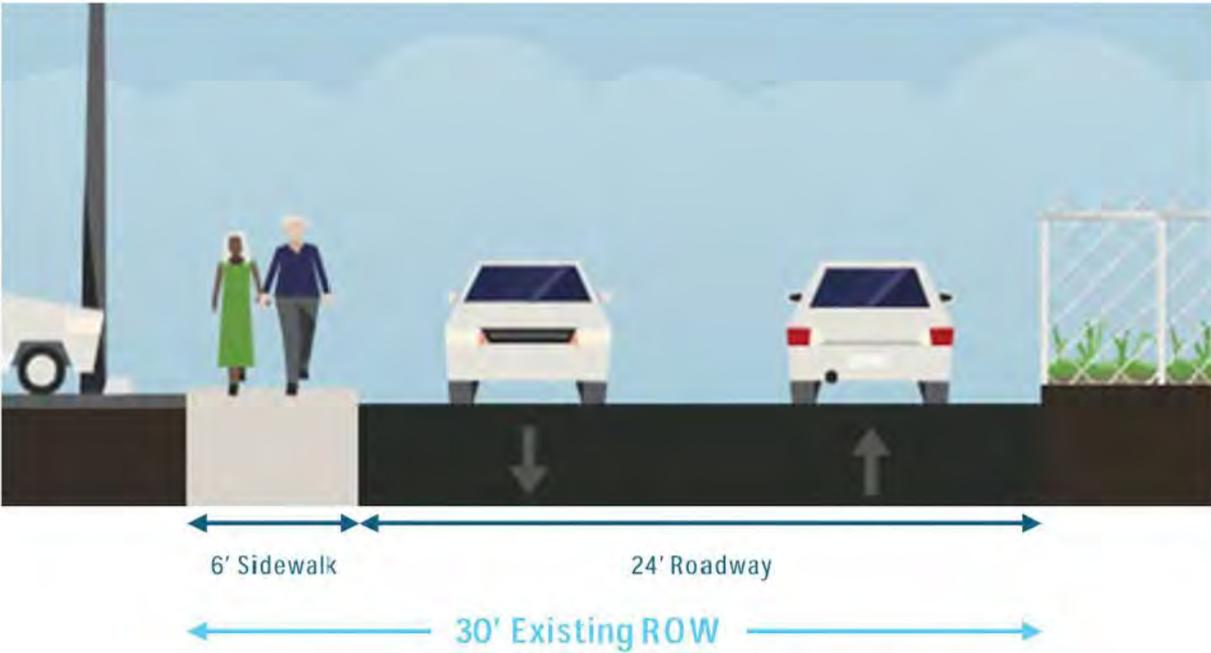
Existing Cross Section for NE 28th Avenue, south of NE 213th Street
